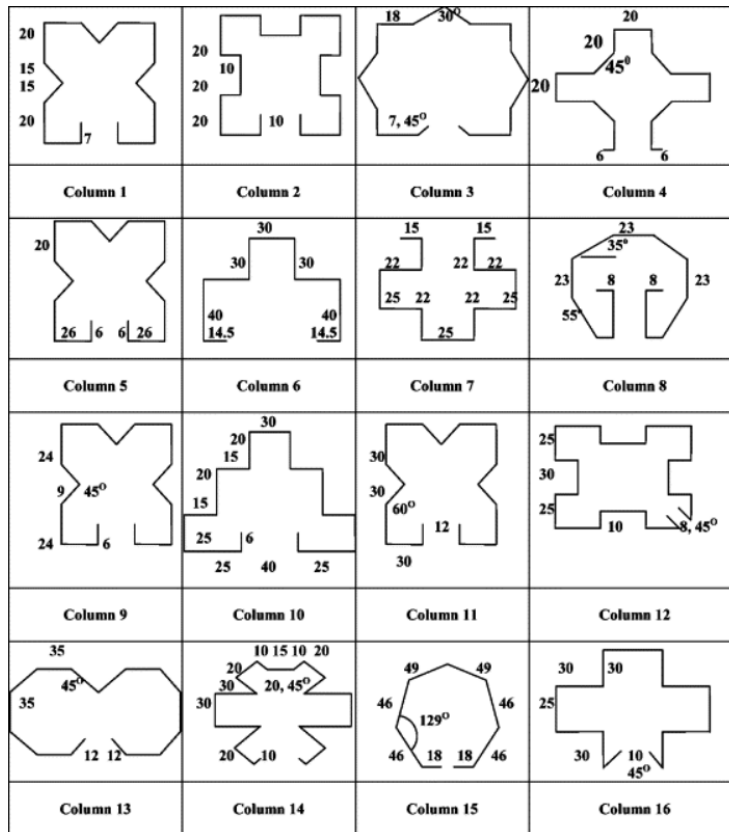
Section geometries of innovative steel columns (All dimensions are measured values in mm)
